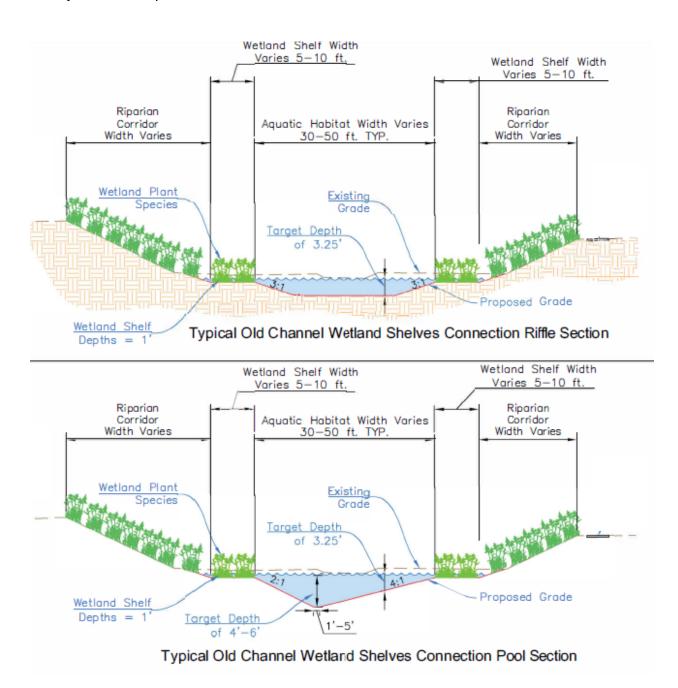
Alternatives A2, A3 and A4 Typical Sections with Wetland Shelves
